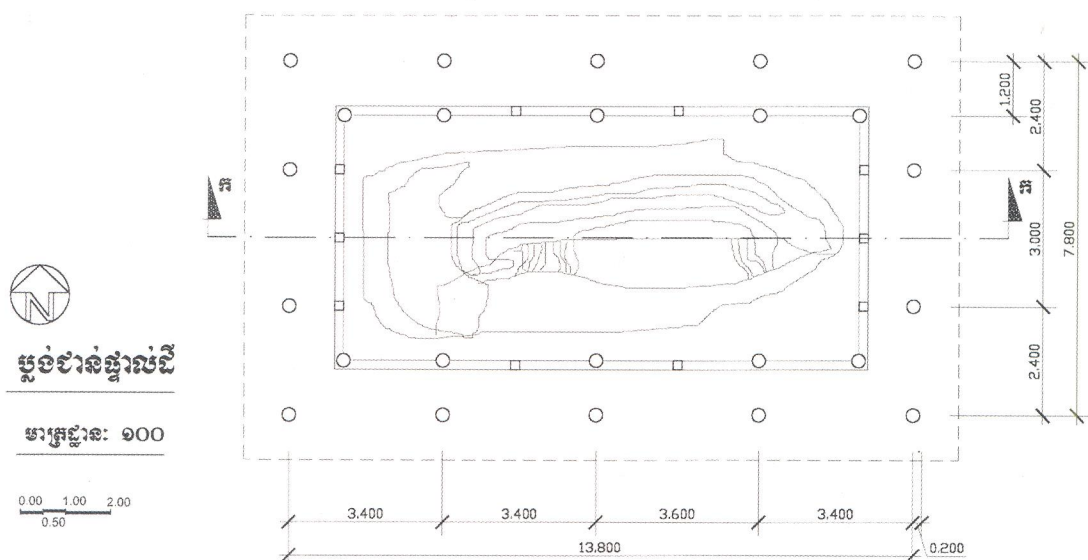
Ground plan for proposed protection and viewing structure over A06.
